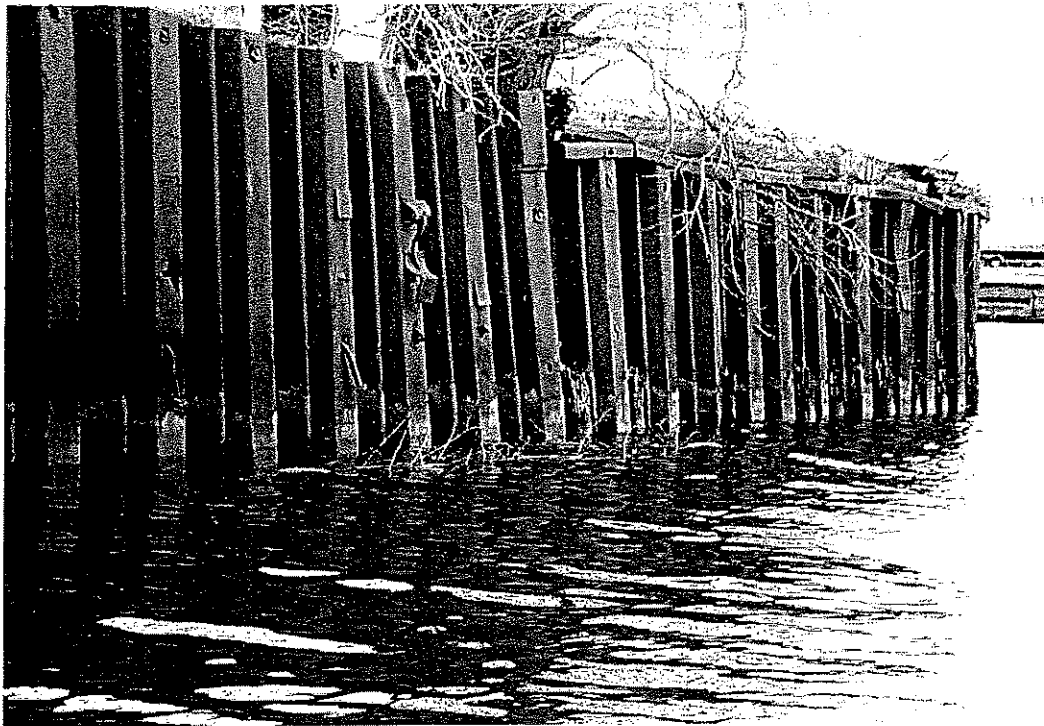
View of Typical Steel Condition along Waterline at Station 0+75, Looking North.
